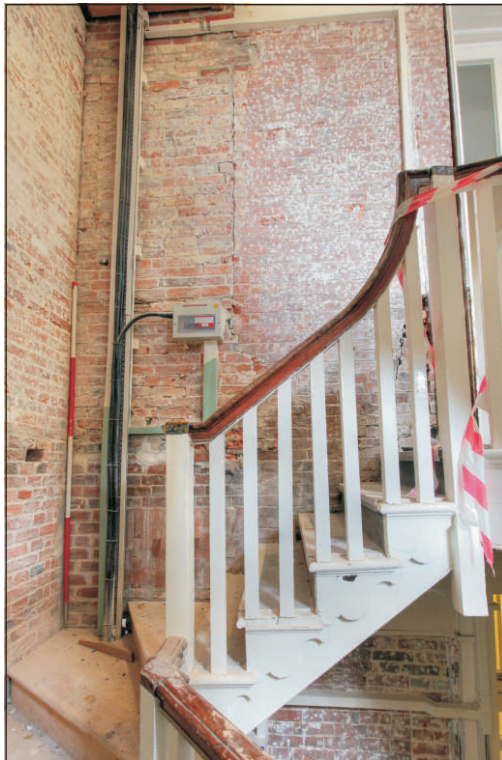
Room 108 – Exposed east wall showing large blocked window opening
